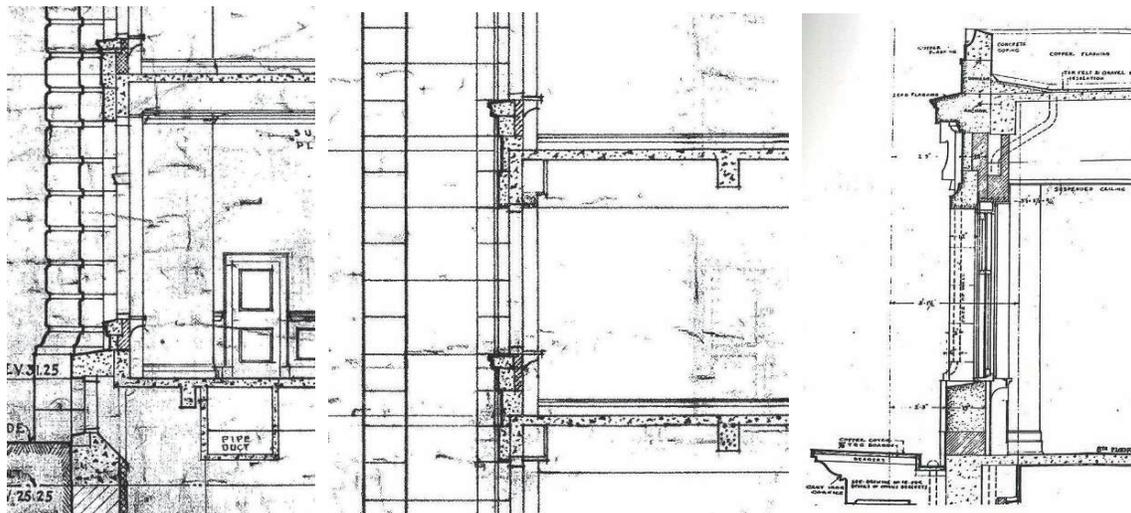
and 42 Southeast corner of 2nd floor, as shown in the original architectural (p. 4) and structural (p. 23).
